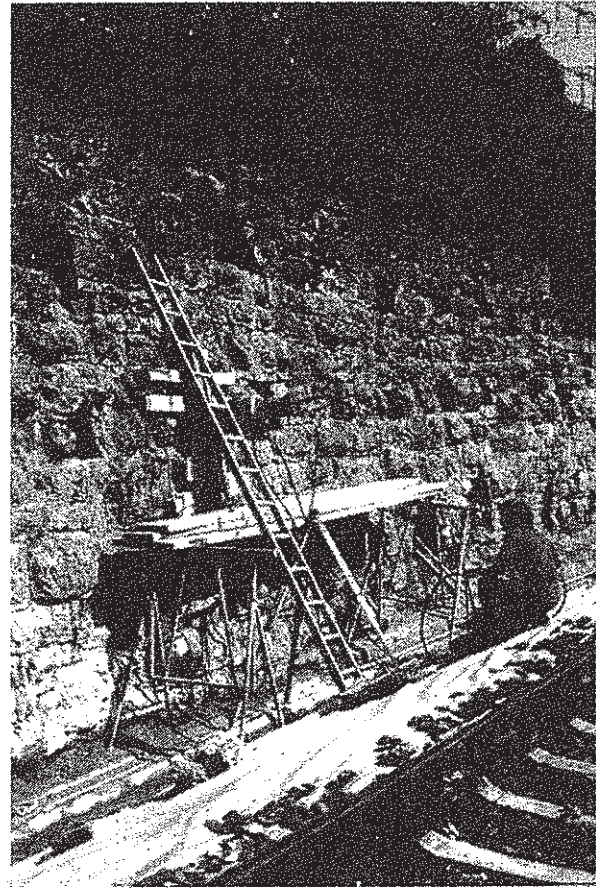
Load test on a soil nail head stabilizing a historical retaining wall.
